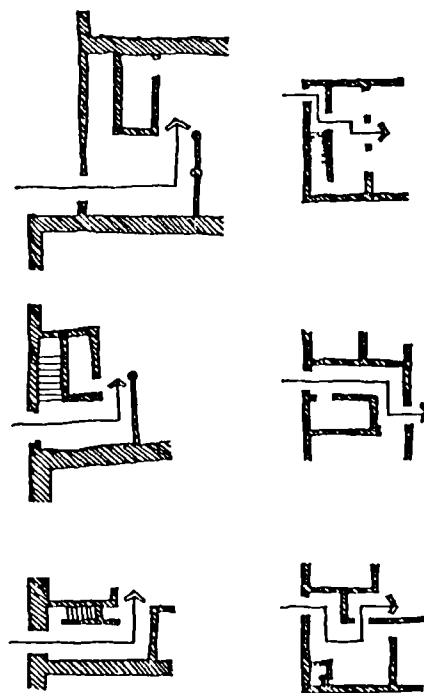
Typical entrance way of the traditional house with a wall placed in such a manner to ensure visual privacy of the interior (after Bahammam, 1987).
